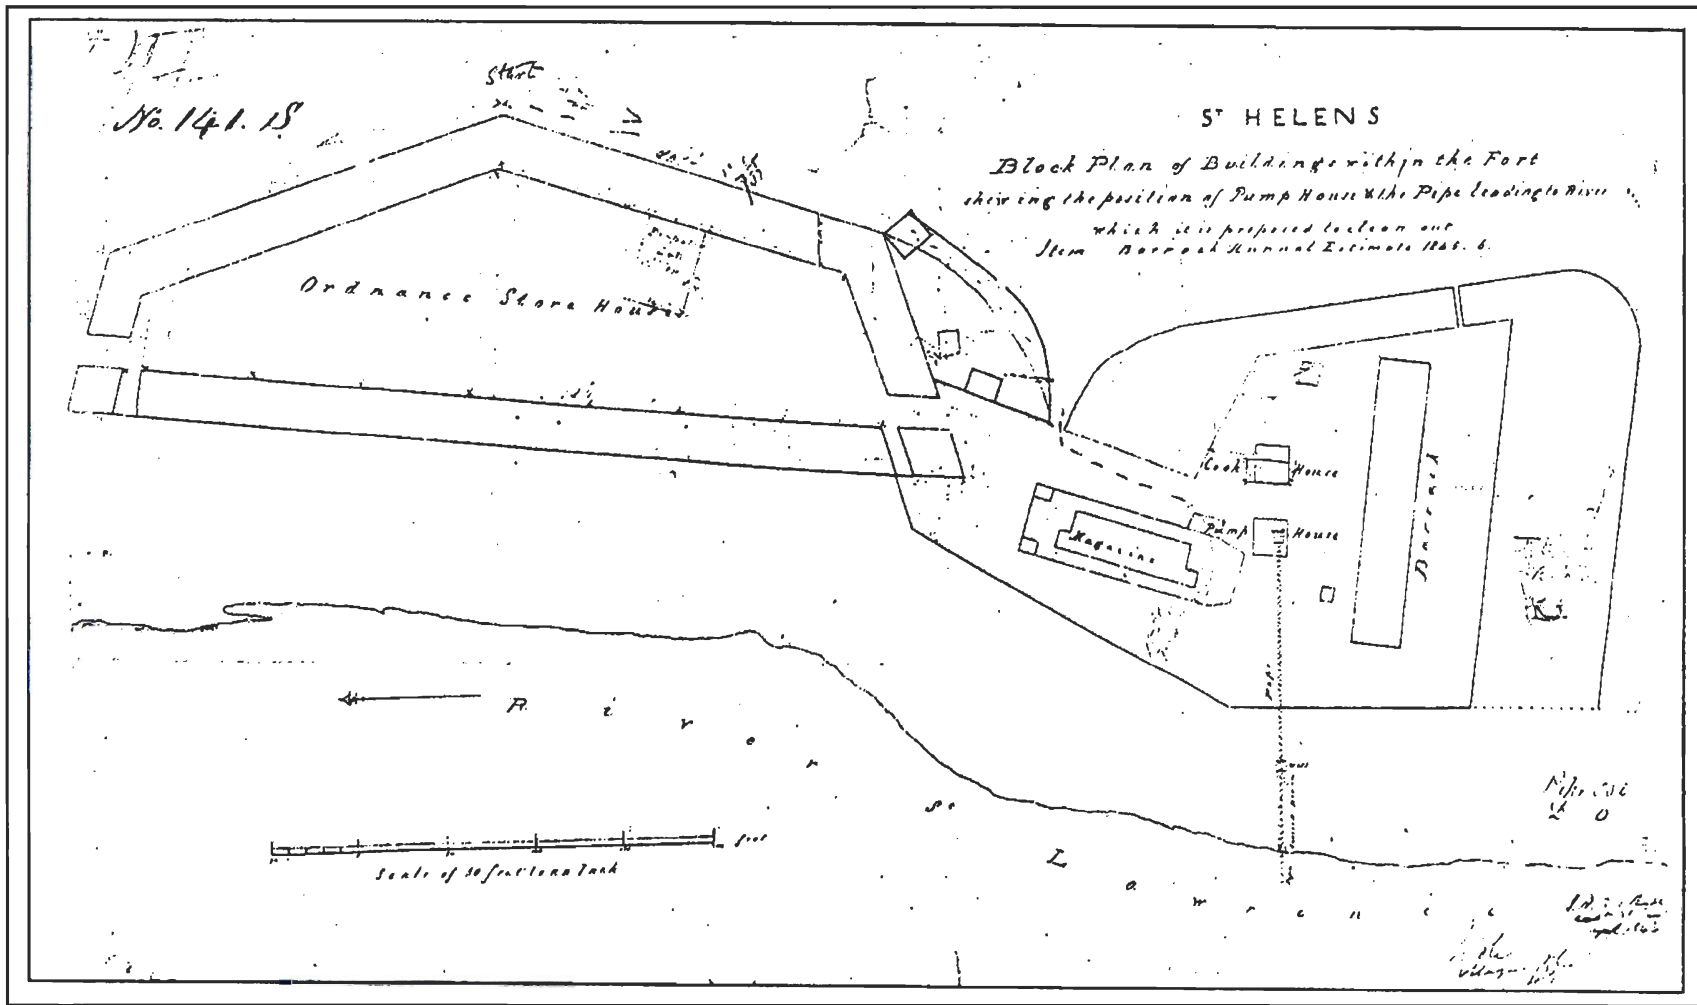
« Block Plan of Buildings within the Fort shewing the position of Pump House & the Pipe leading to River which is proposed to clean out », 1844 (ANC NMC 2199)
